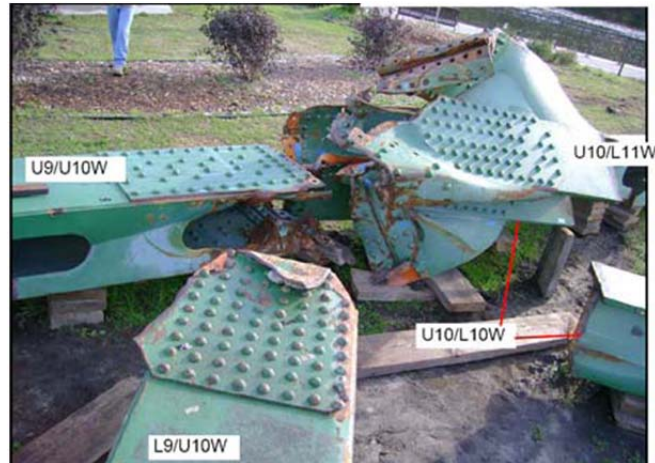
Gusset Plate of I-35W Bridge After Failure
